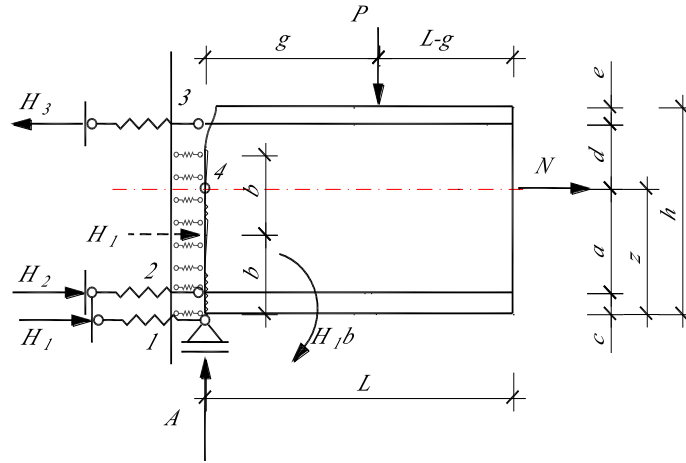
Supports of cantilever beam to column and asymmetrical cross section
